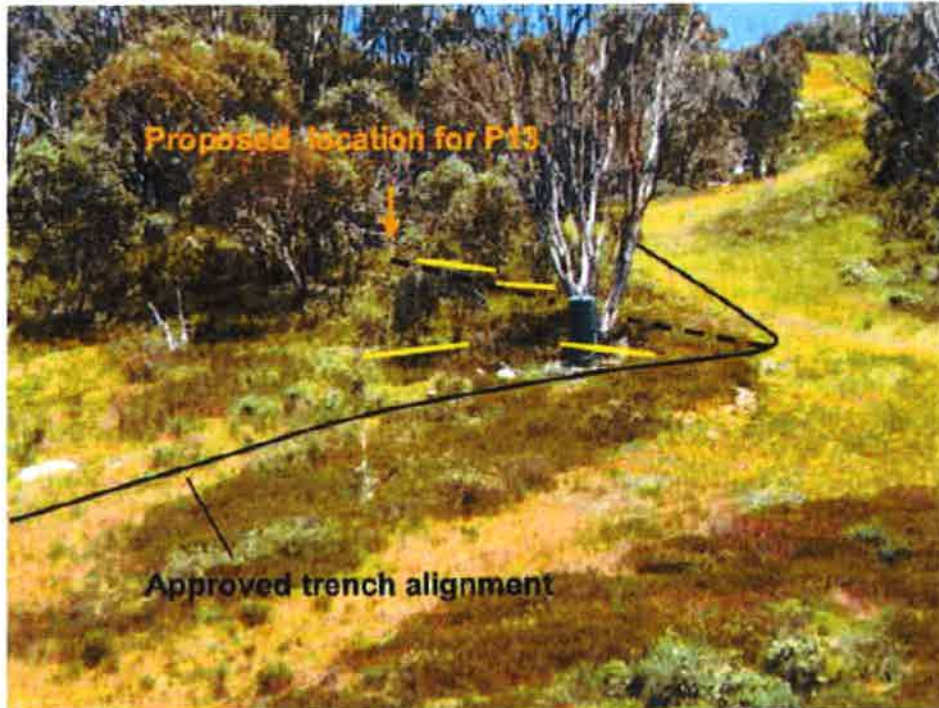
Overview of the proposed works, the broken black line showing the proposed lateral trench and the orange arrow showing the proposed snow gun pit location (source: SEE).
